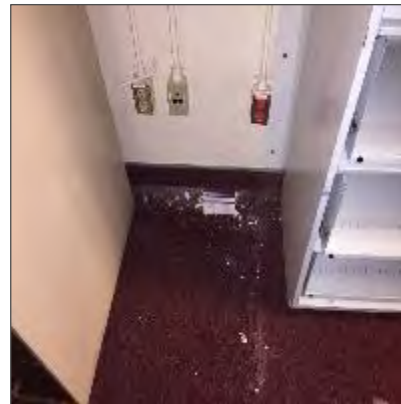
Asbestos-containing plaster debris, McMaster Wing Basement Vacant Offices.
